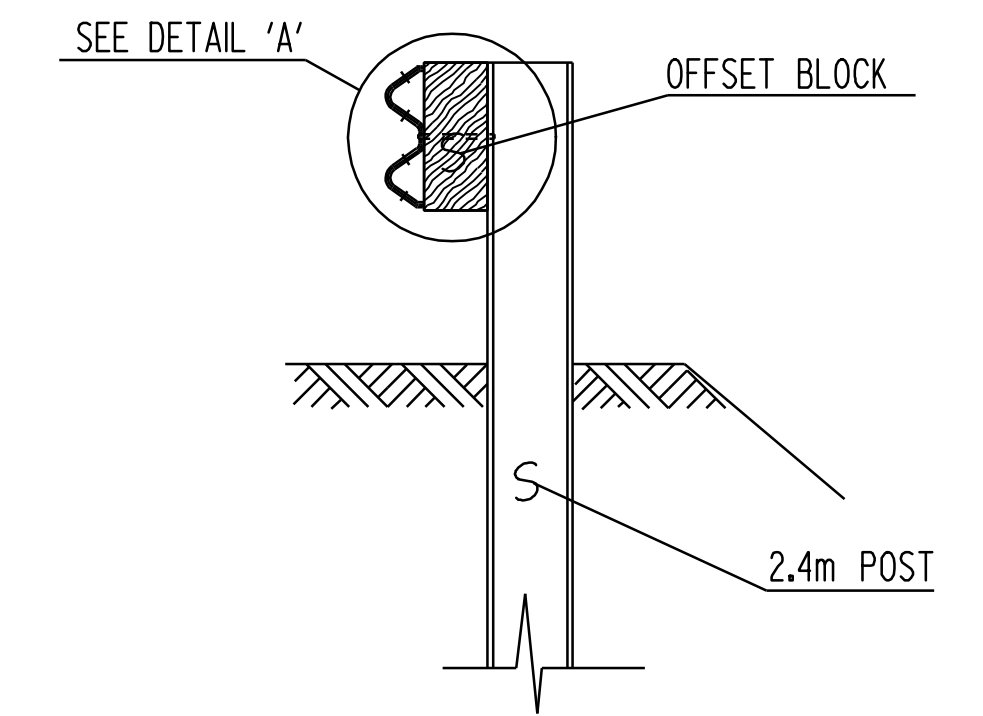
DETAIL OF STEEL BEAM GUARD RAIL AT LARGE CULVERTS/BRIDGES
